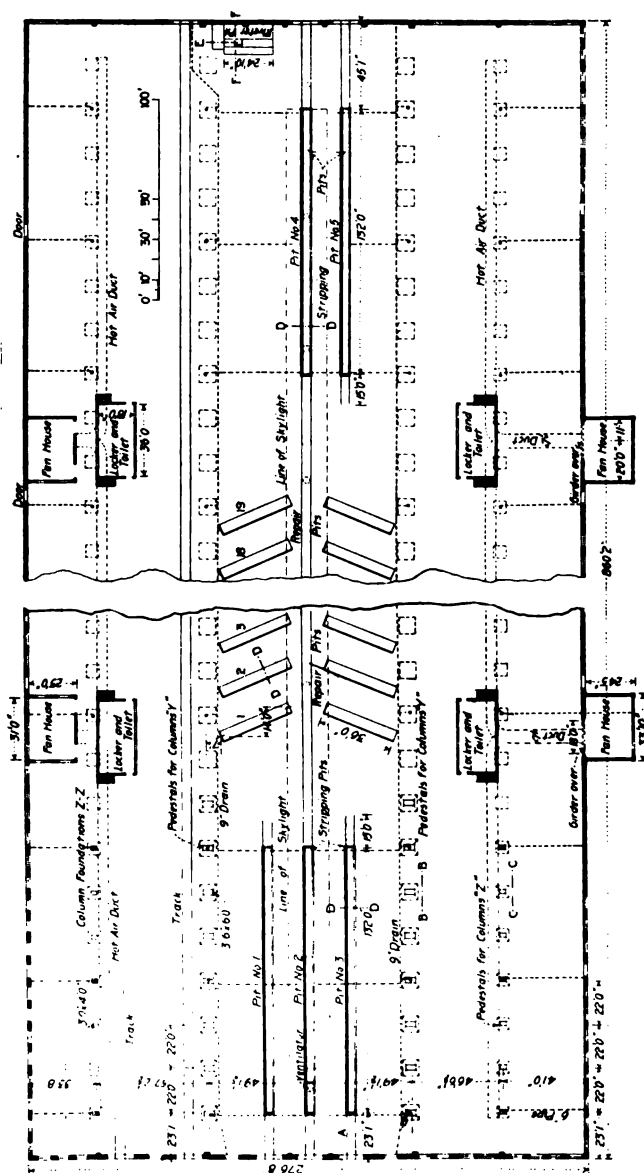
PLAN OF MAIN LOCOMOTIVE SHOP (ERECTING, MACHINE AND BOILER SHOPS), C., R. I. & P., EAST MOLINE.
